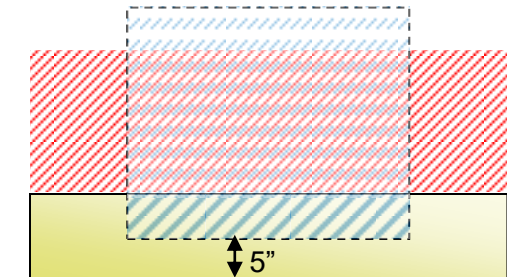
D: SCHEMATIC PLAN SECTION E-E
